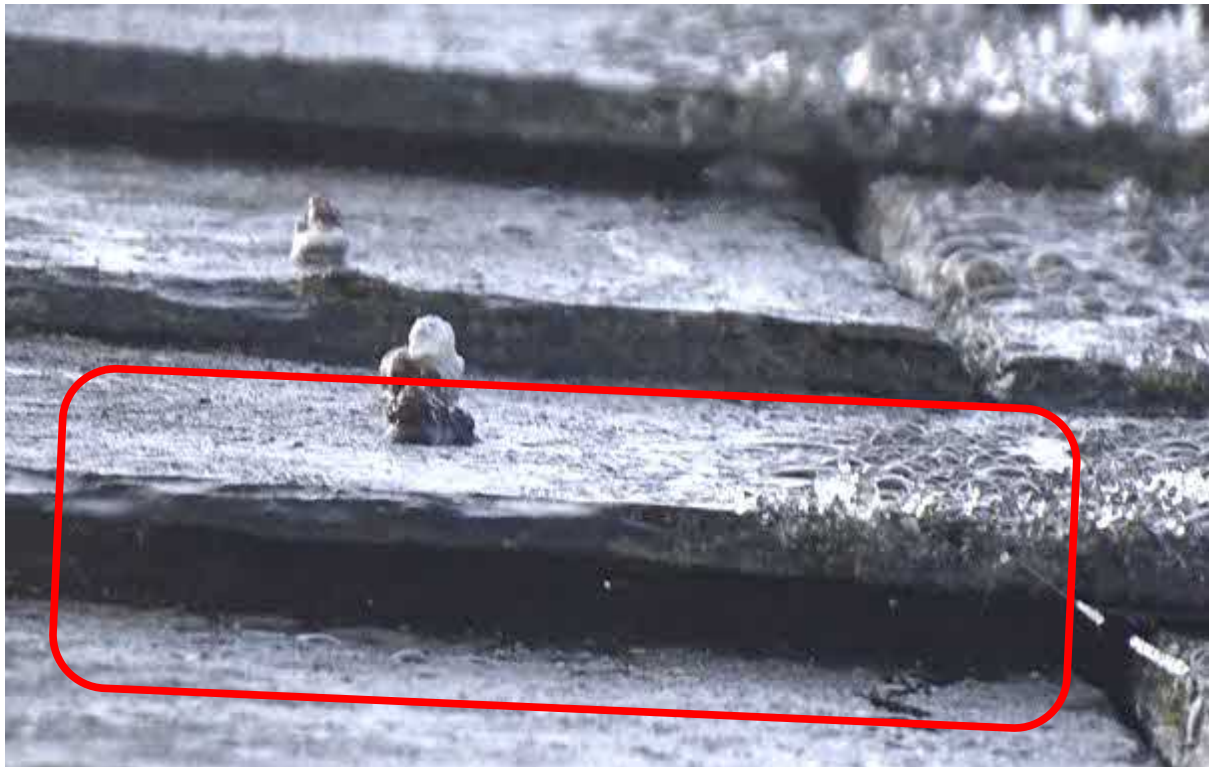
Building two – Small number of gaps within the eaves areas of the building which look to offer further likely shelter/access opportunities for bats
